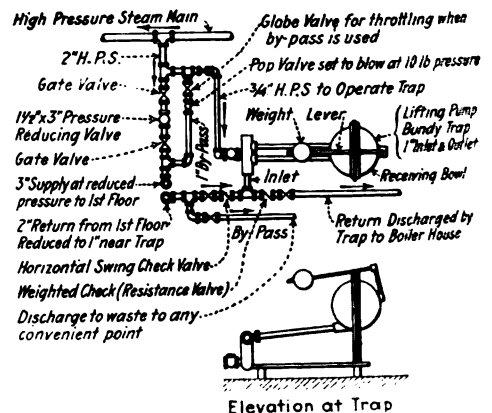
PLAN OF LIFTING PUMP TRAP, REDUCING VALVE, ETC., IN BASEMENT.
